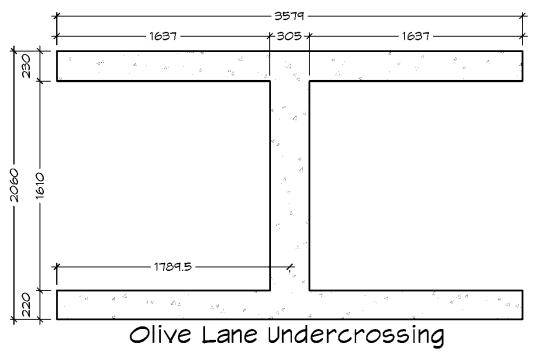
Modeled cross-section for Olive Lane Undercrossing bridge (largest box section; dimensions in mm.)
